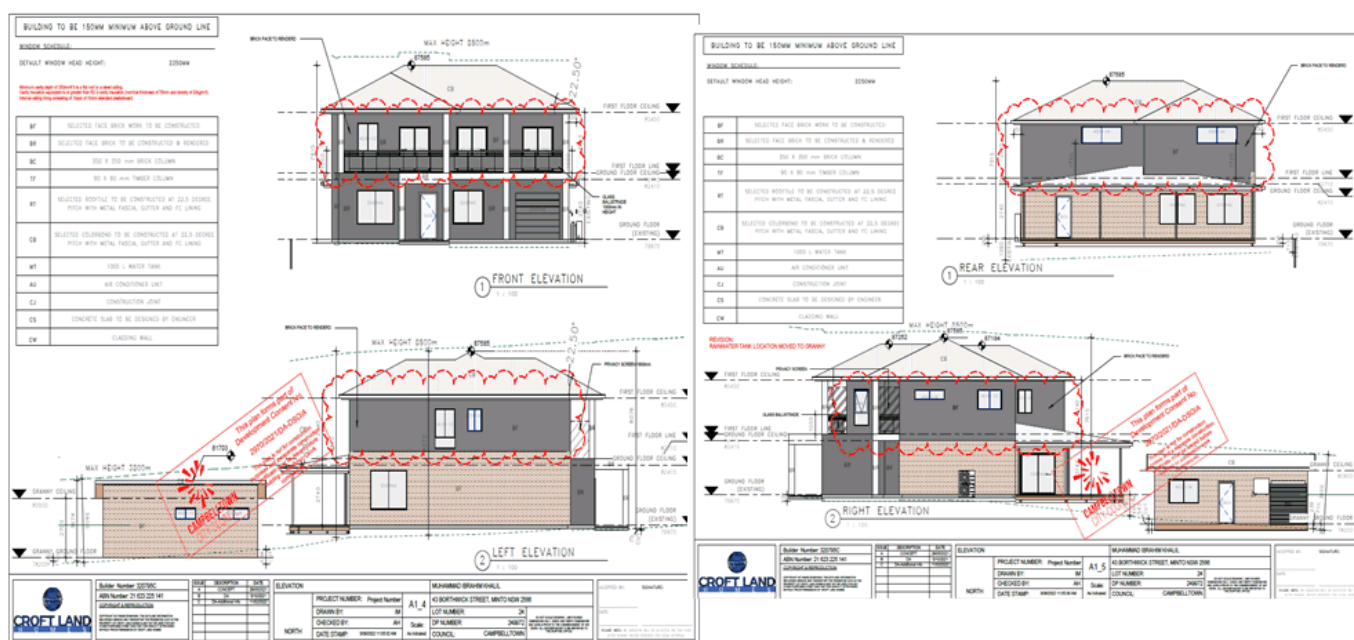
Approved Plan, External First Floor wall was of Rendered.
